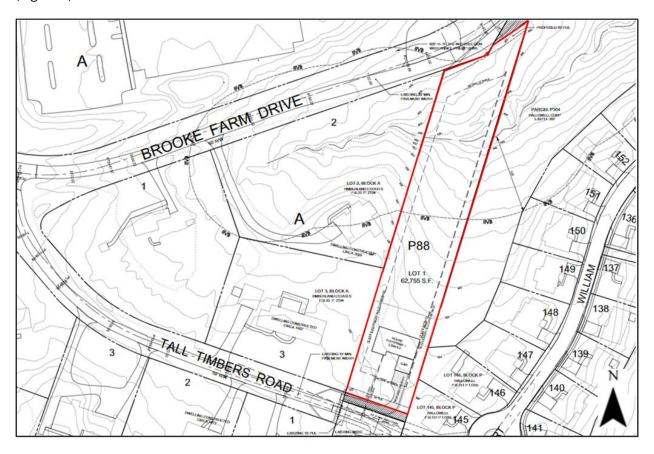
Pre-Preliminary Plan Layout, Subject Property outlined in solid red line
